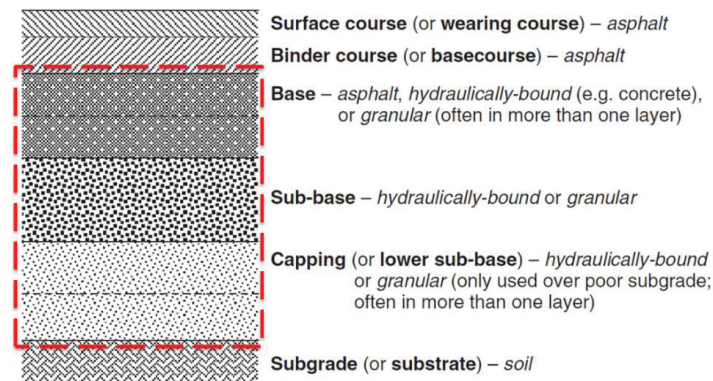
Flexible pavement structure with unbound layers highlighted (Thom 2014)
